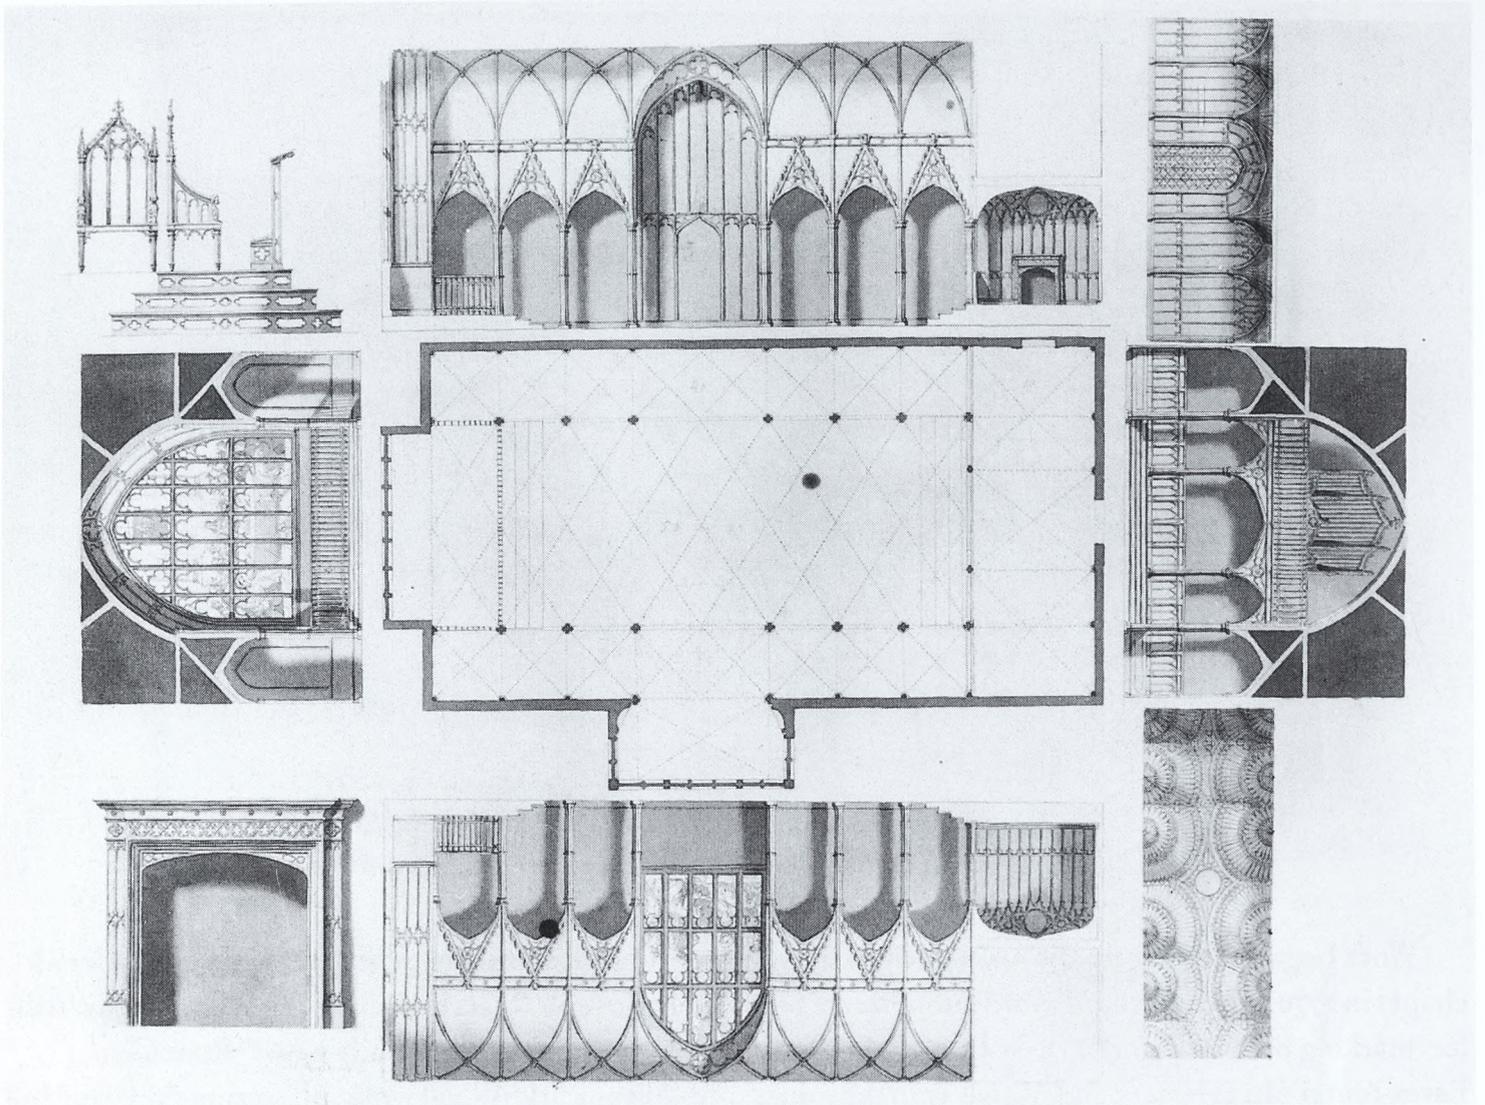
Plan, internal elevation of proposed chapel, elevation of proposed chair and desk, internal south elevation, ceiling plan and chimneypiece of proposed family pew, Audley End House. *English Heritage.
